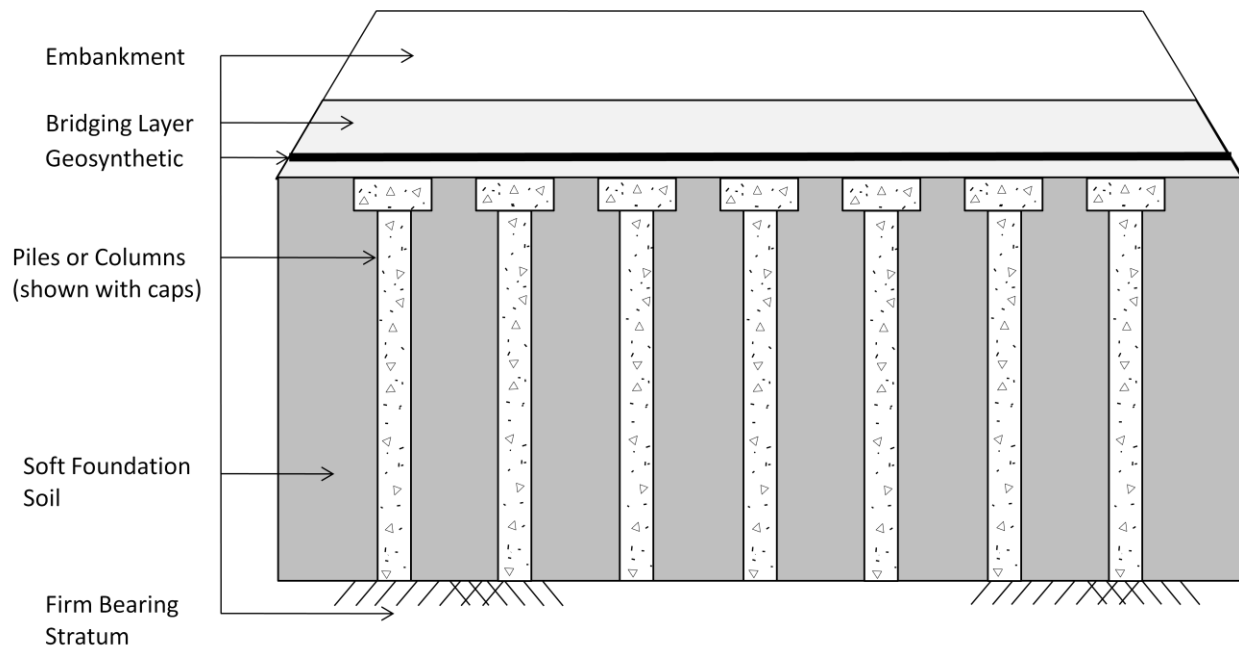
Reinforced Geotechnical Composite Foundation System
